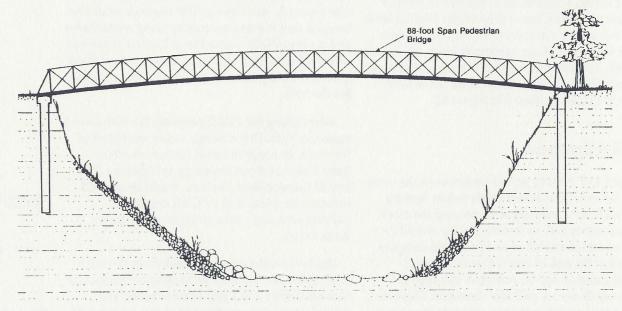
PEDESTRIAN BRIDGE AT SLEEPER PARK
